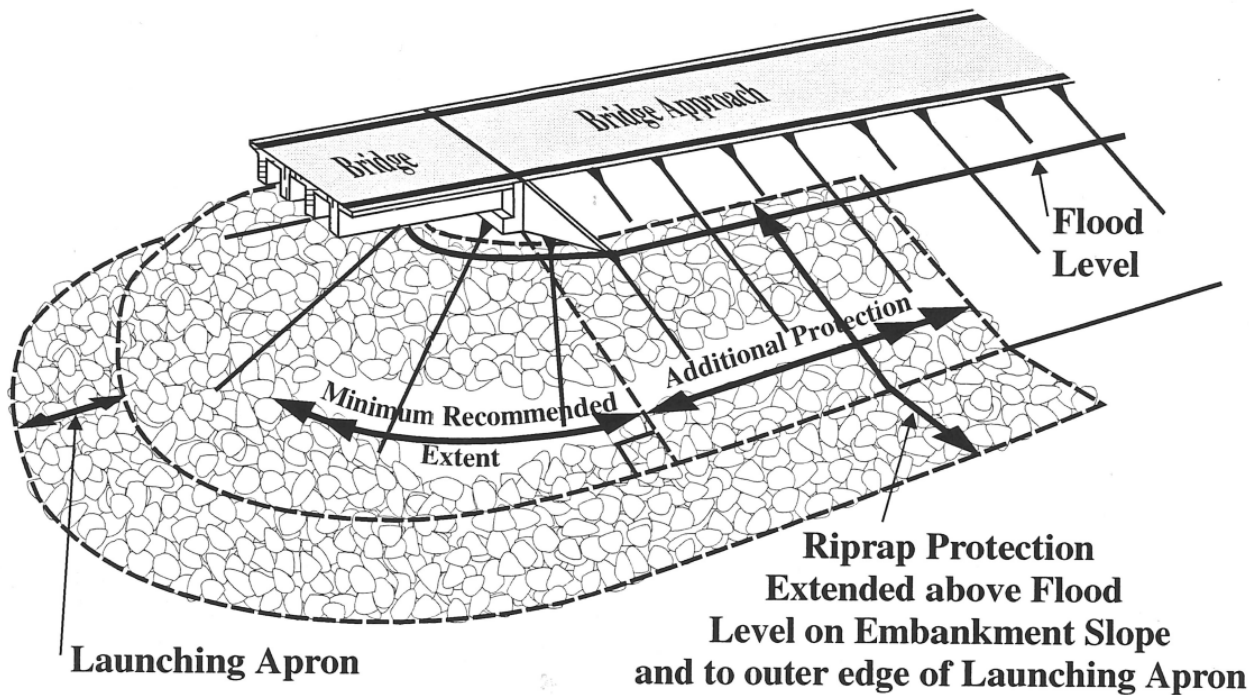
Recommended practice for the placement of riprap protection at bridge abutments (Source: Fig 9.29 in Melville and Coleman (2000)).
